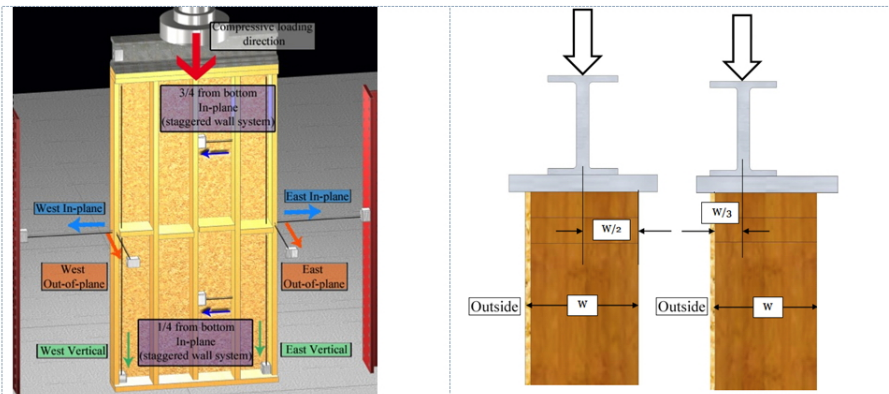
(left) Wall specimen set-up shows the positions of vertical, in-plane, and out-of-plane deflectometers; (right) Loading set-up for both concentric (left) and eccentric (right) tests
